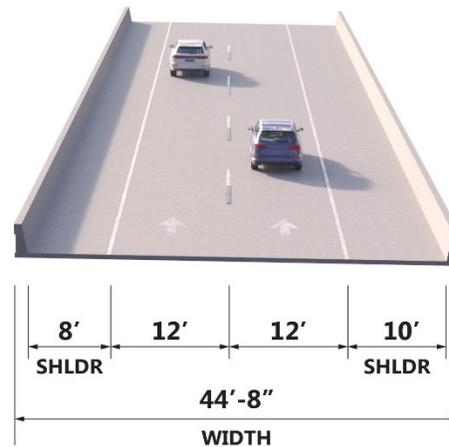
shows the proposed typical section for the northbound US 41 bridge over SR 597 (N. Dale Mabry Highway). The bridge provides two 12-foot lanes, an 8-foot inside shoulder, and a 10-foot outside shoulder.
